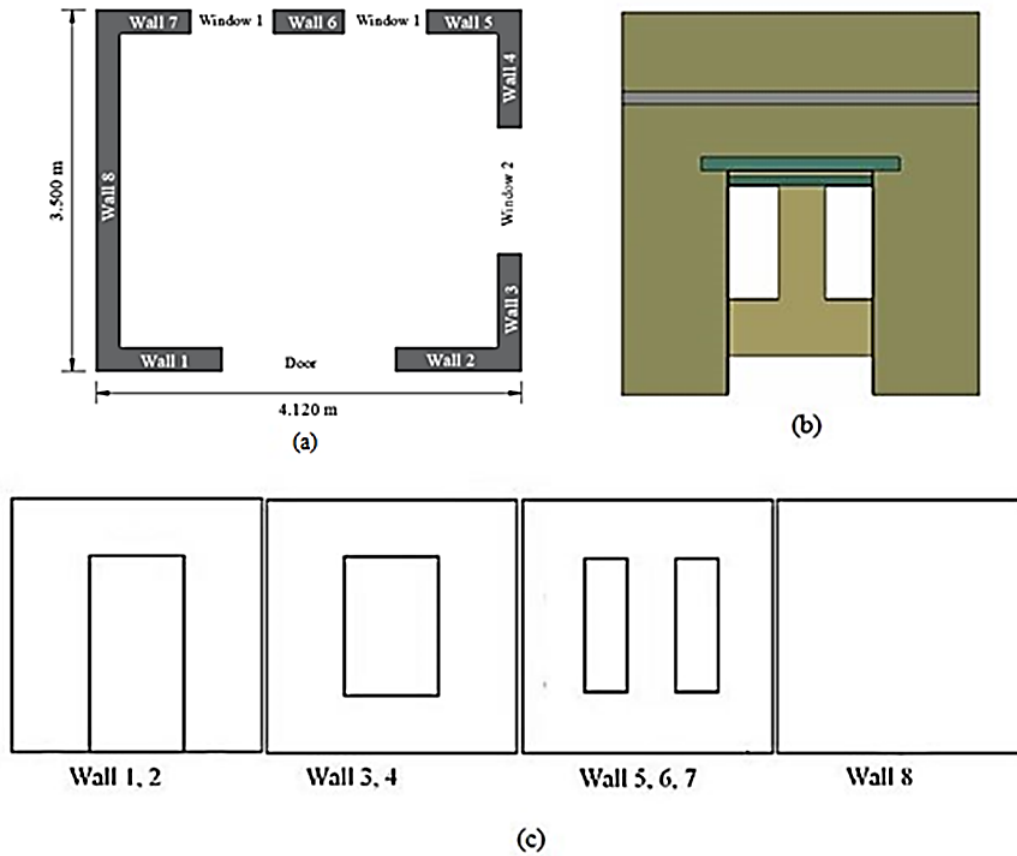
Building geometry (a) Plan View, (b) 3D Model, (c) Elevation
